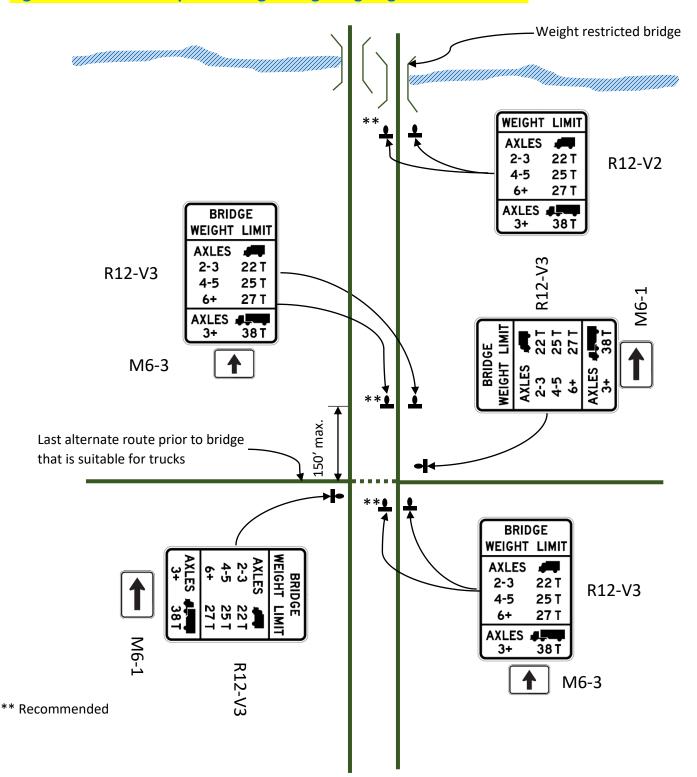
B- V2a. Example of Bridge Weight Signing on Undivided Road
